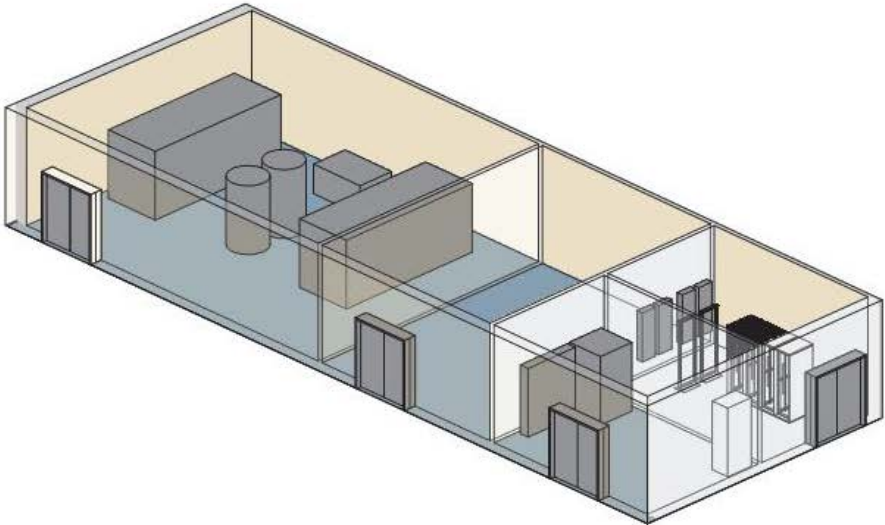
Module J Floor Plan & Axonometric
